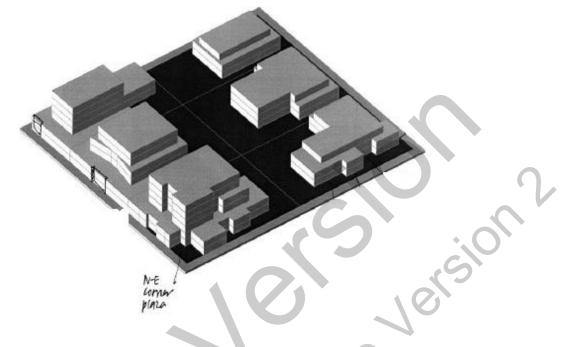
Articulation of building form with steps and recesses
